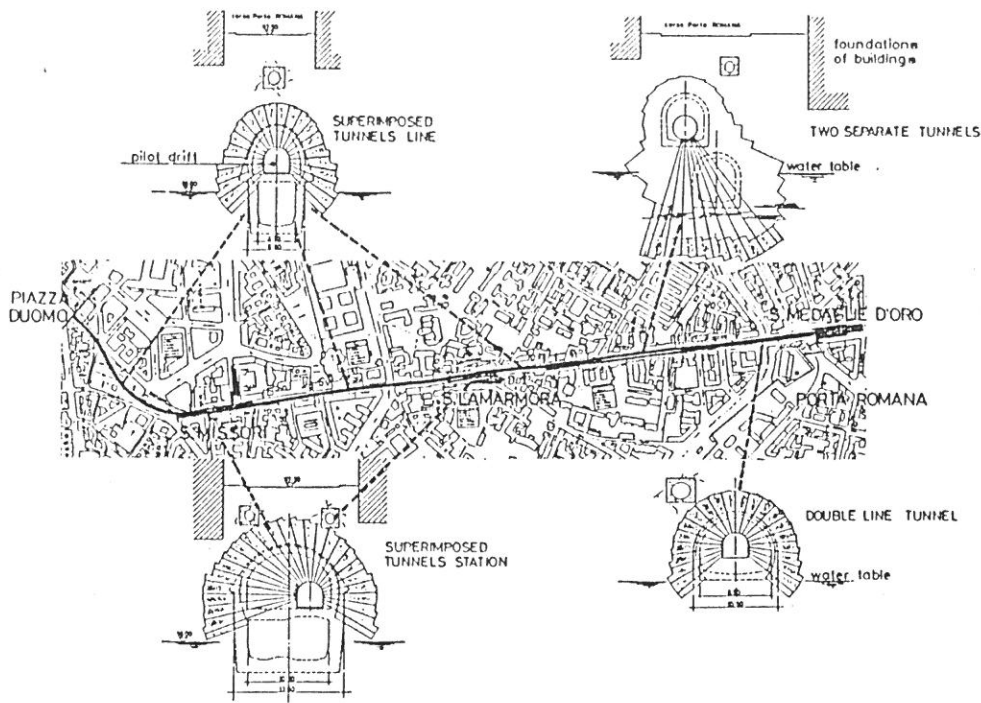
Layout of lot 2B and typical cross sections of the tunnels
